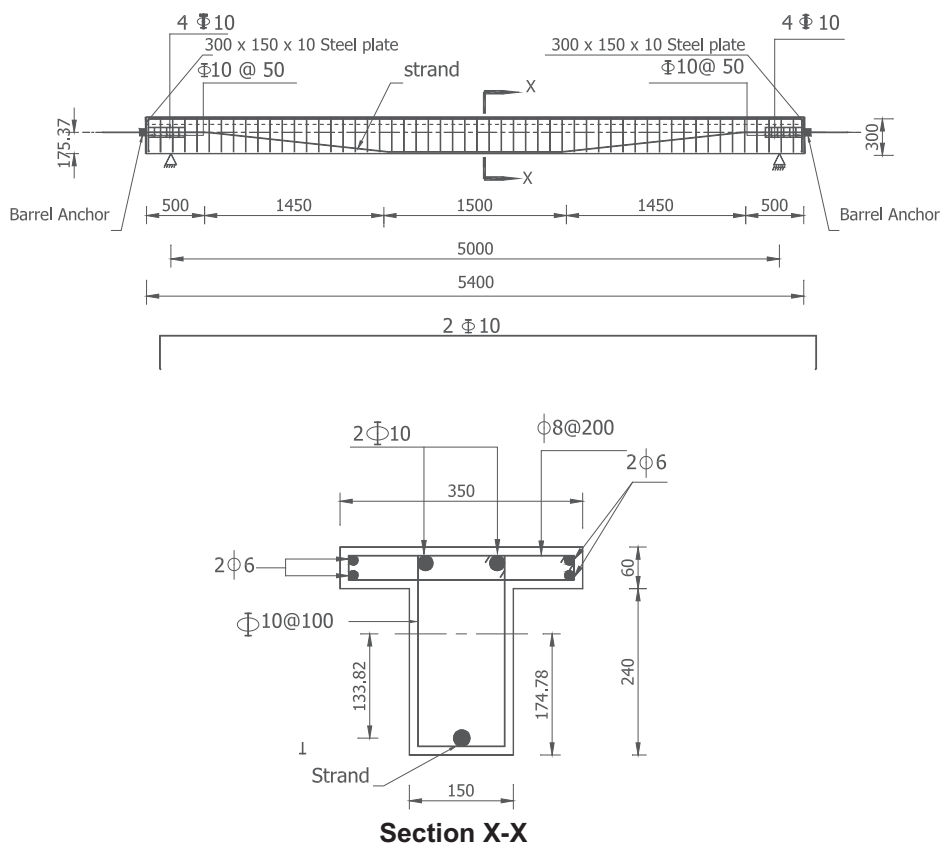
Flexural reinforcement for fully prestressed beams of group one. Typical details for fully prestressed beams of group one.
